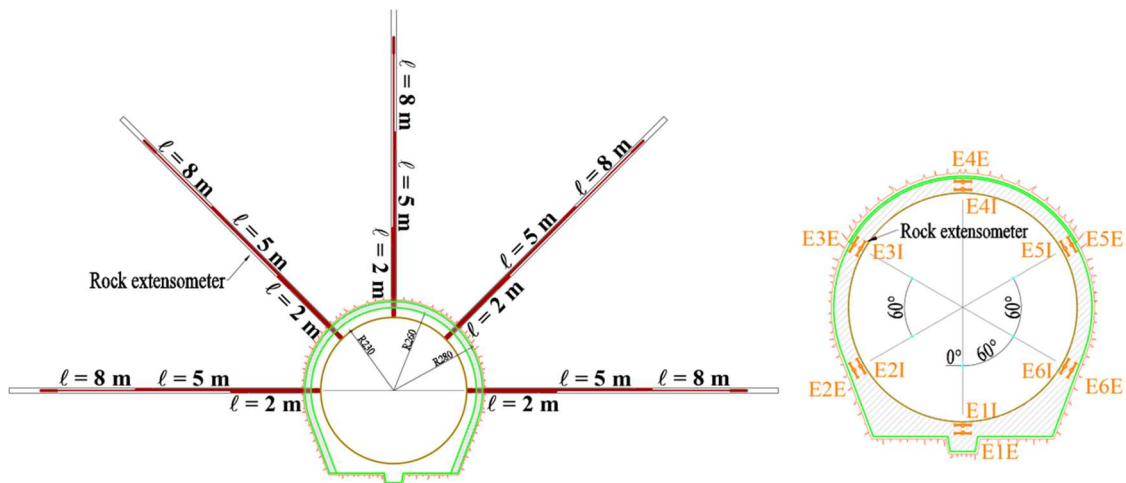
Layout of rock extensometers in one measurement profile (left), layout of extensometers in concrete in one measurement profile (right)
